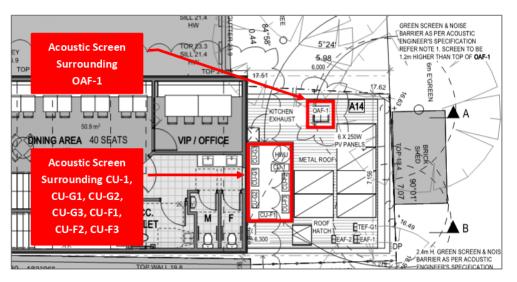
Mechanical Plant Acoustic Screen Location – First Floor (Image Source: YBL Remmus Architecture)
